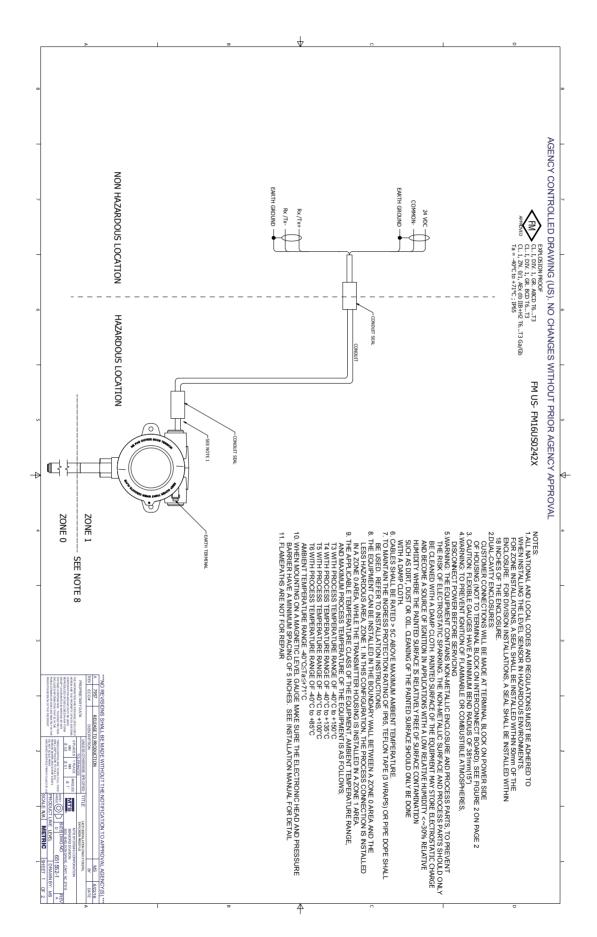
Explosionproof, FM Installation Drawing, HART®, Page 1
